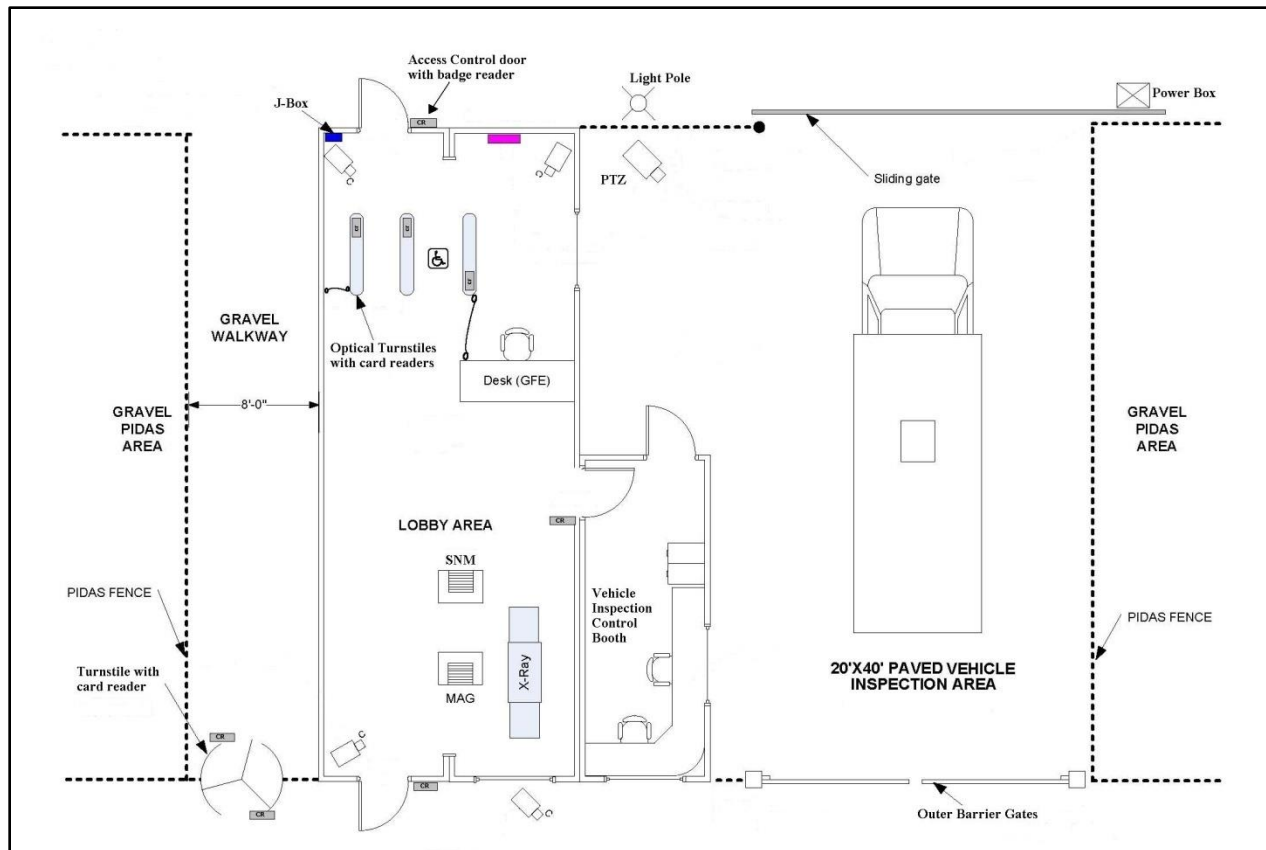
Floor Plan for Building 9825I, Simulated Entry Control Facility
